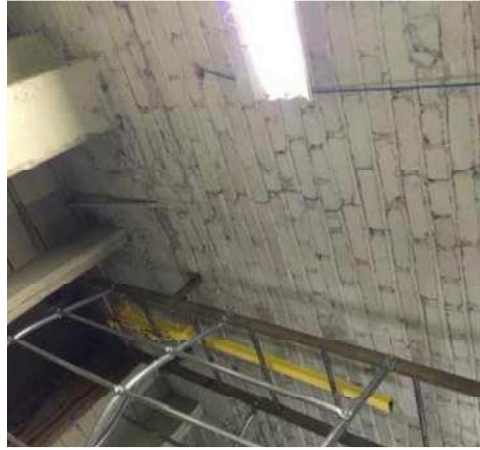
Stress cracks in brick wall @ SW stair
